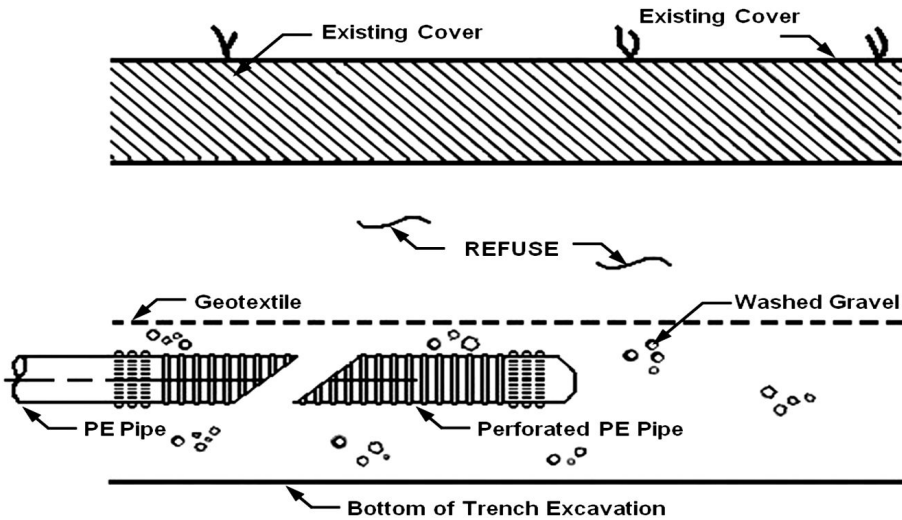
Schematic Diagram of a Perimeter Excavation Trench System.²³
